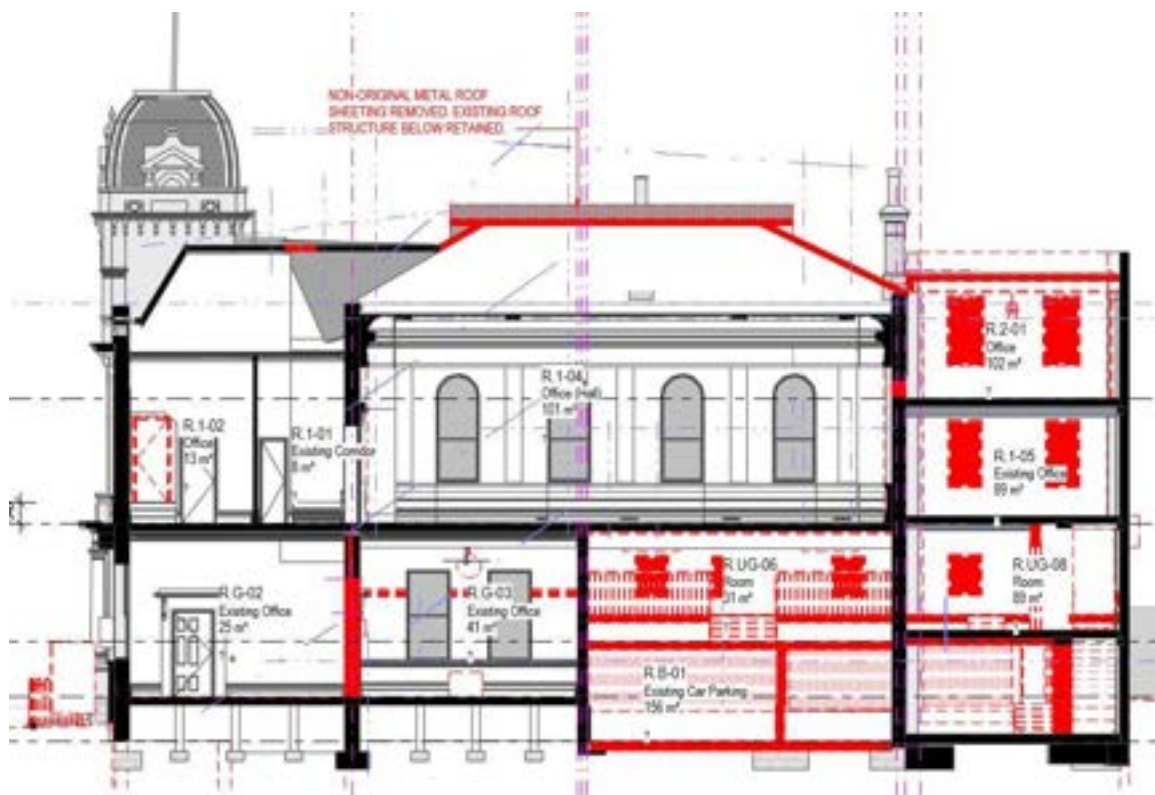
A2-251 Demolition section across the original building and 1980s section. Source: Trethowan Architecture, 2025.
